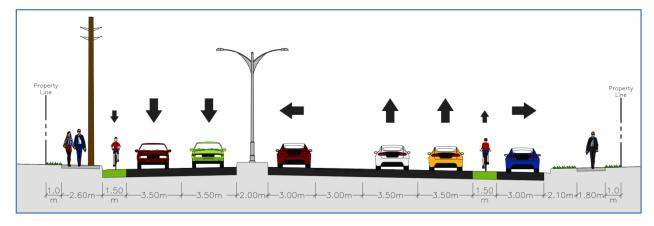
Preferred Design, Hamilton Road Cross-Section- West of Highbury Avenue
